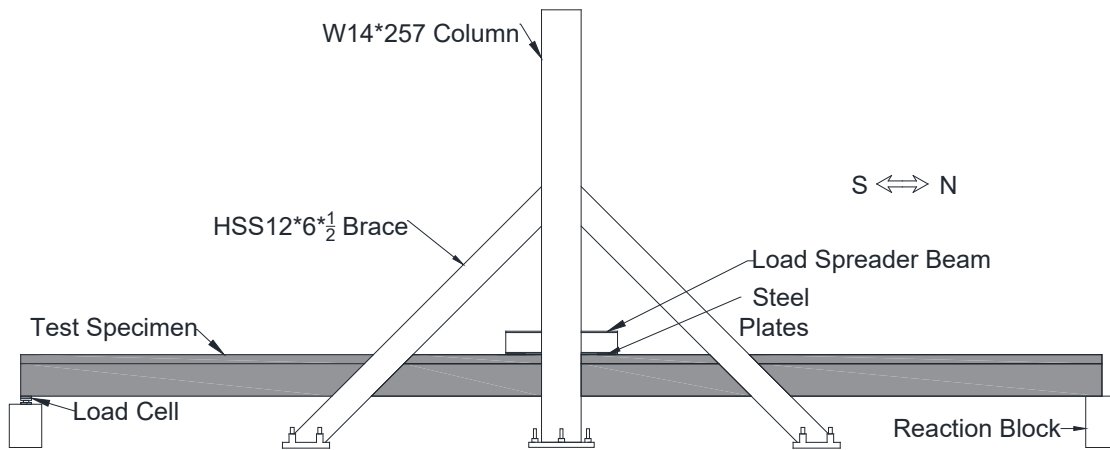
Strength Test Setup for Salvaged Girders – Elevation View
